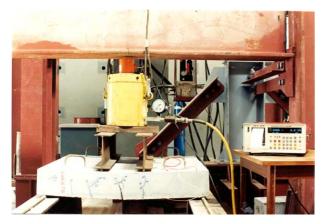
Experimental setup utilized to induce cracks in the slab specimens.
